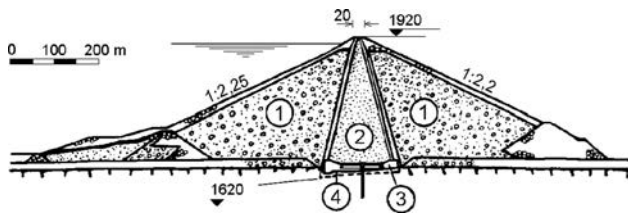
Nurek dam (Tajikistan), 300 m high. (1) Sandy gravel; (2) loam; (3) concrete block with grouting gallery; (4) consolidation grouting up to 20 m.
